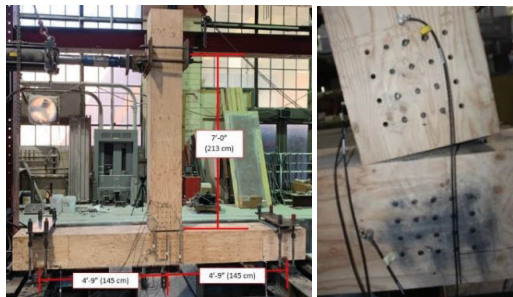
Beam-column joint setup and maximum rotation for joint with 12 beam dowels
